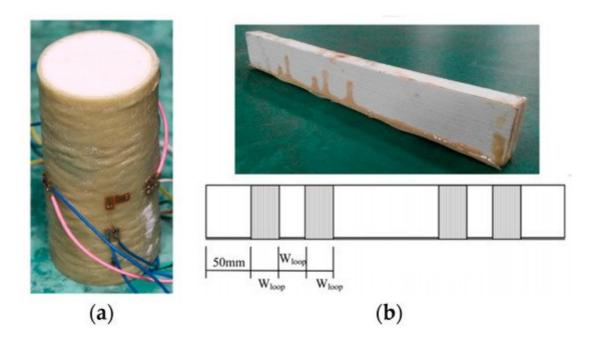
Applications of FRP sheet reinforcement in printed concrete members: (a) printed concrete column wrapped by FRP sheets and (b) printed concrete beam looped by FRP sheets [<u>66</u>].
